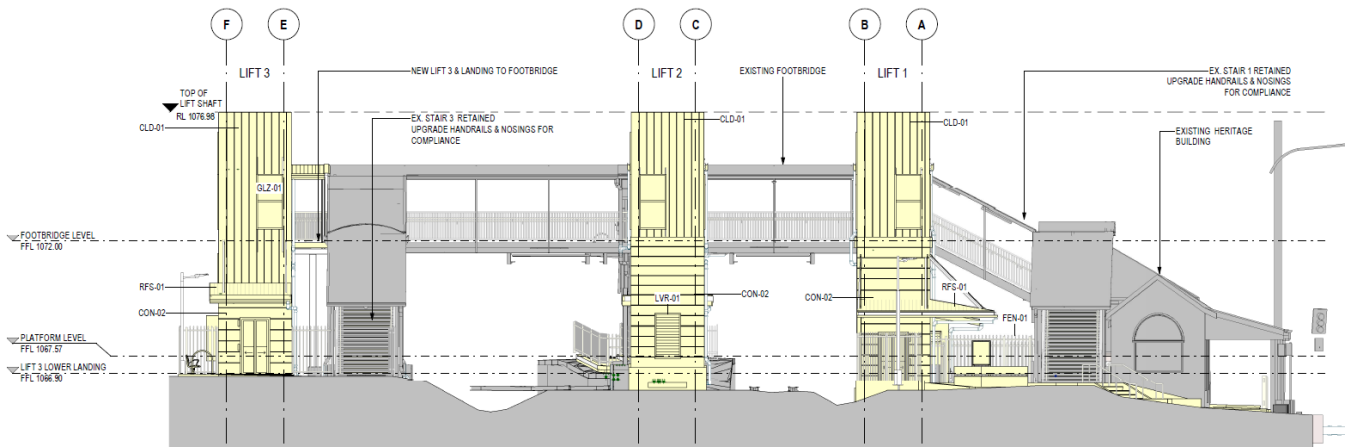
South-east elevation of the Proposal, extracts from Arenco DesignInc Architectural Drawings, February 2022
